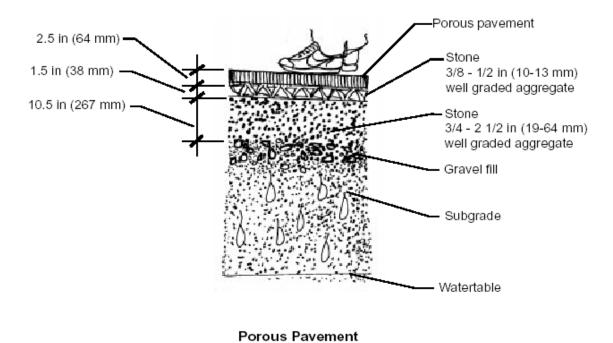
This section through a porous or permeable pavement installation is suitable to free draining sub-soils. More sophisticated geotechnical engineering, design and construction may be required for sites with cohesive soils.
